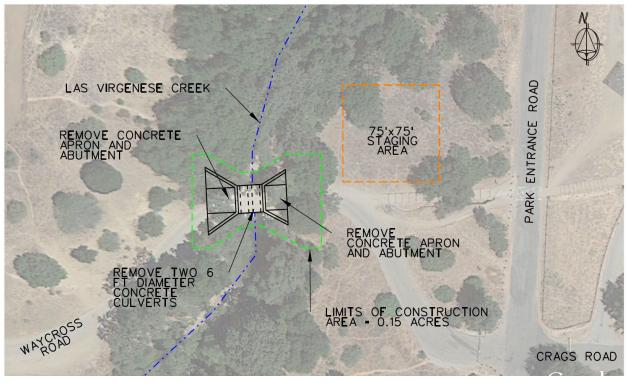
LV1, Crags Road Culvert Schematic Design Part A
